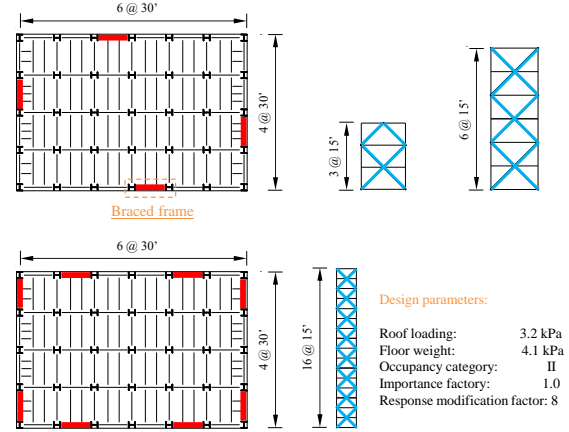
Plan and elevation views of 3-, 6-, and 16- story braced frames
